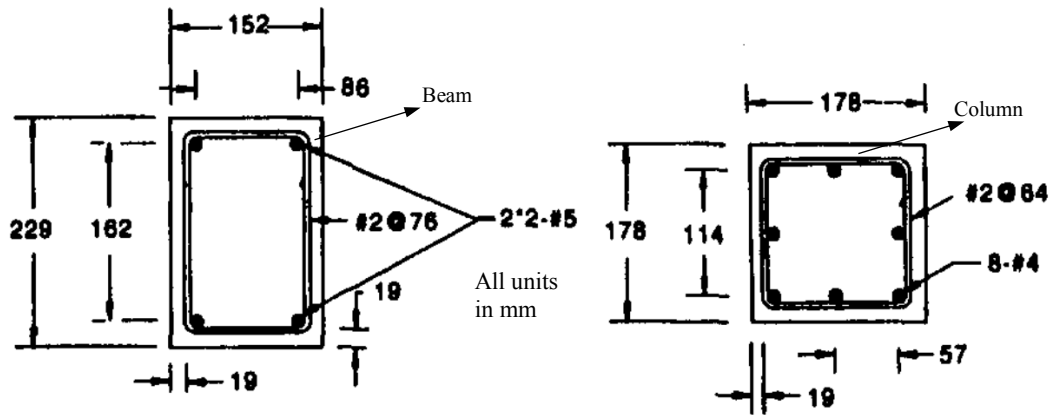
Section Details of Test Specimens (Mehrabi, 1994)
